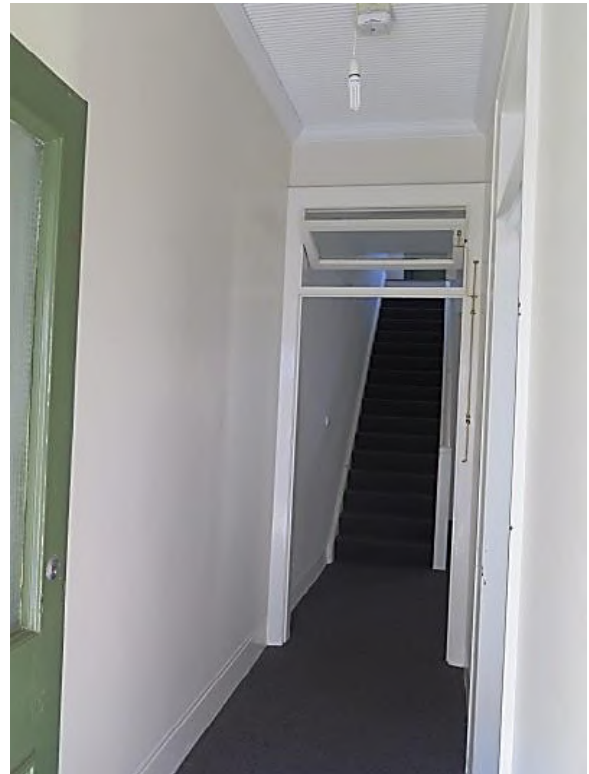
Entry (space 1.1)—48A / 46–56 Gloucester Street, showing carpeted timber floor, cement run skirtings, timber cornice, ripple iron ceiling and timber door frame with fanlight to the living room (space 1.3). (Source: GML Heritage, May 2016)
